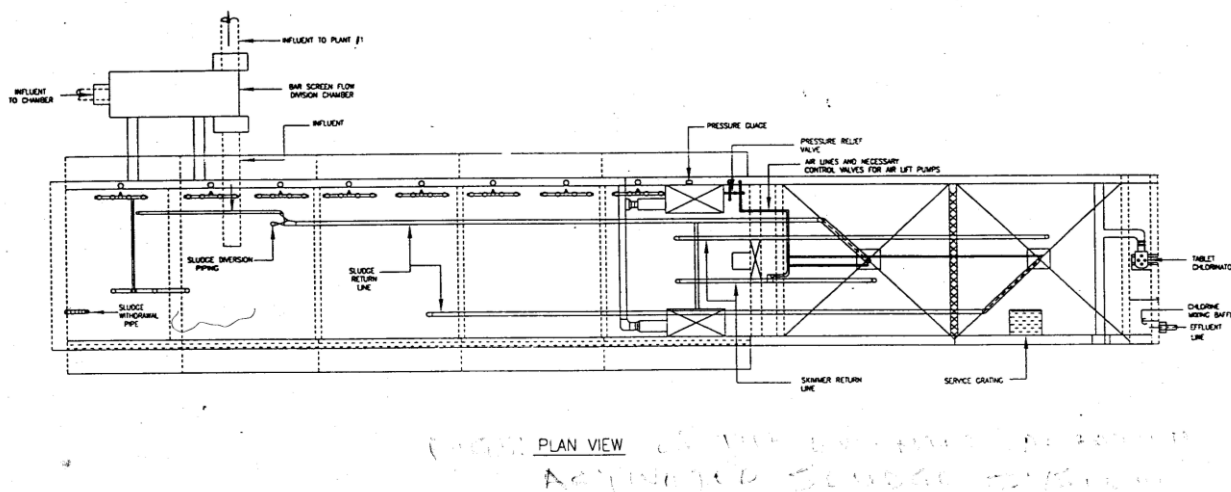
Plan View Of The Extended Aeration Activated Sludge System
